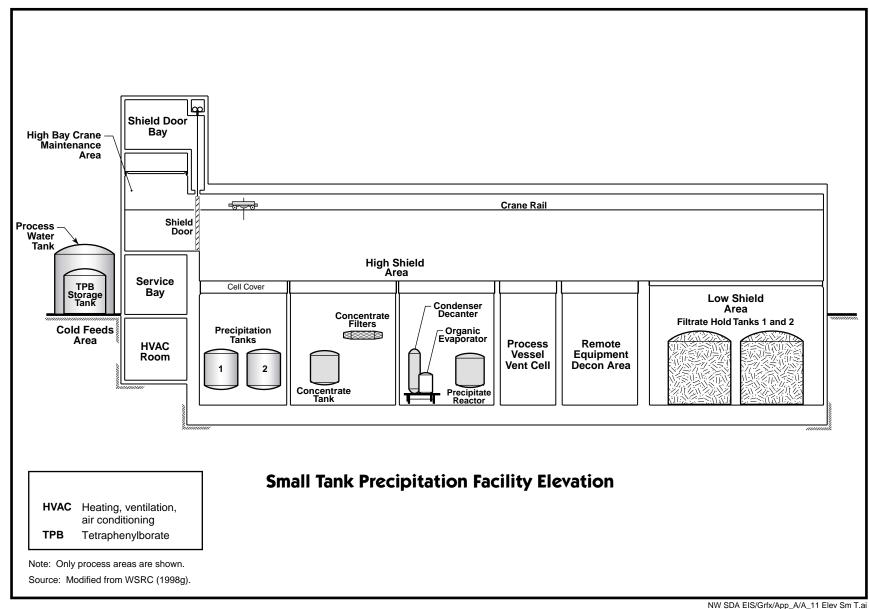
Elevation Plan for Small Tank Precipitation facility.
